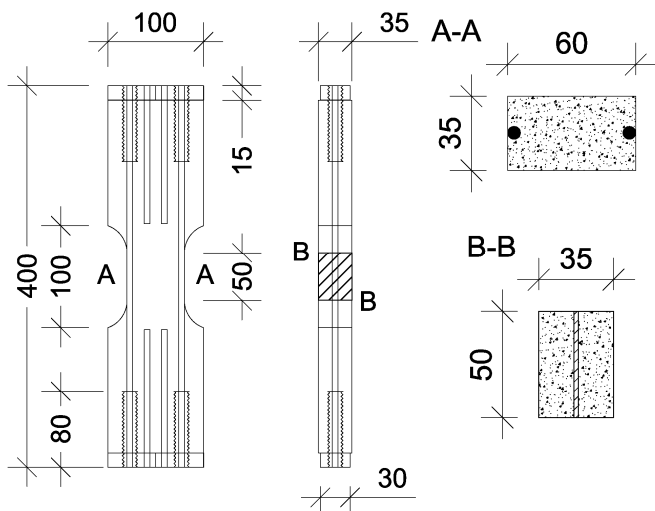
Geometry and layout of reinforced prism (interface setup) used to evaluate the rebar-matrix interface in tensile loading.
